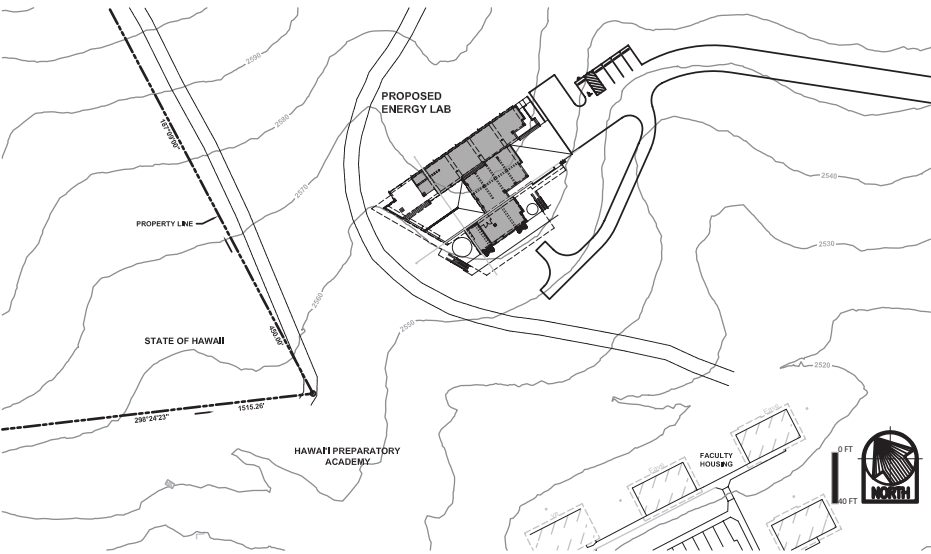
Hawaii Preparatory Academy site plan © Flansburg Architects.
